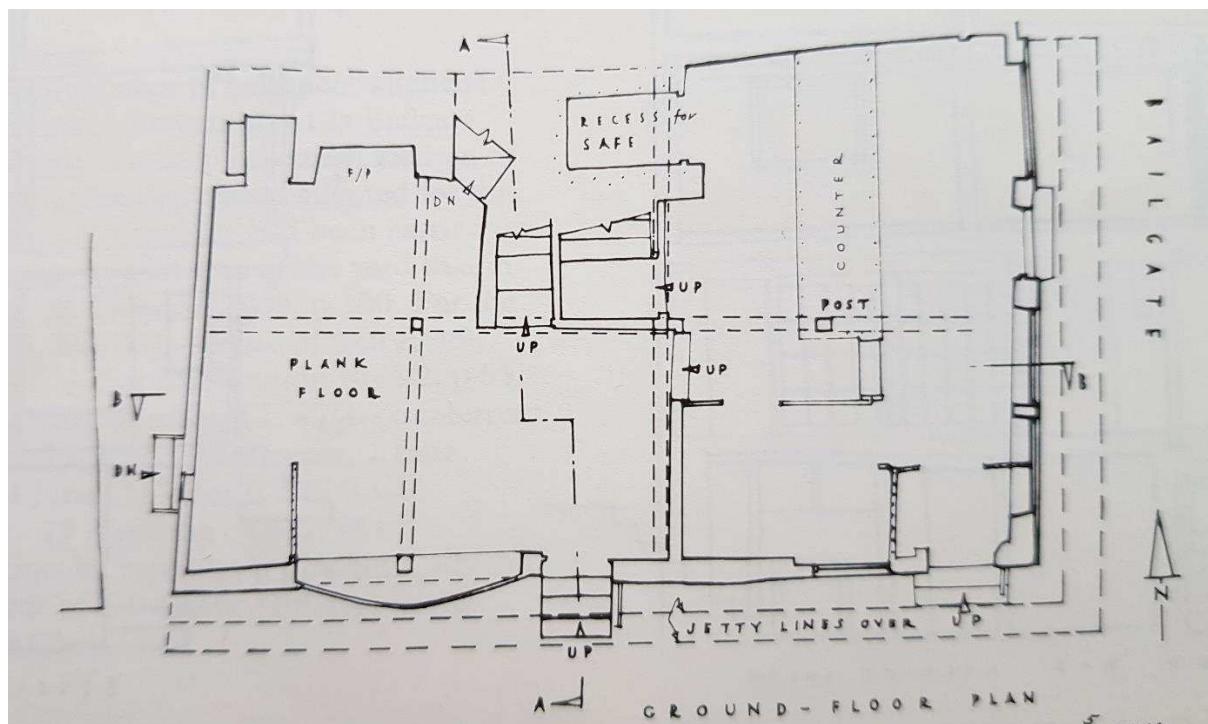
Ground floor plan based on a survey from February 1957.⁶³
